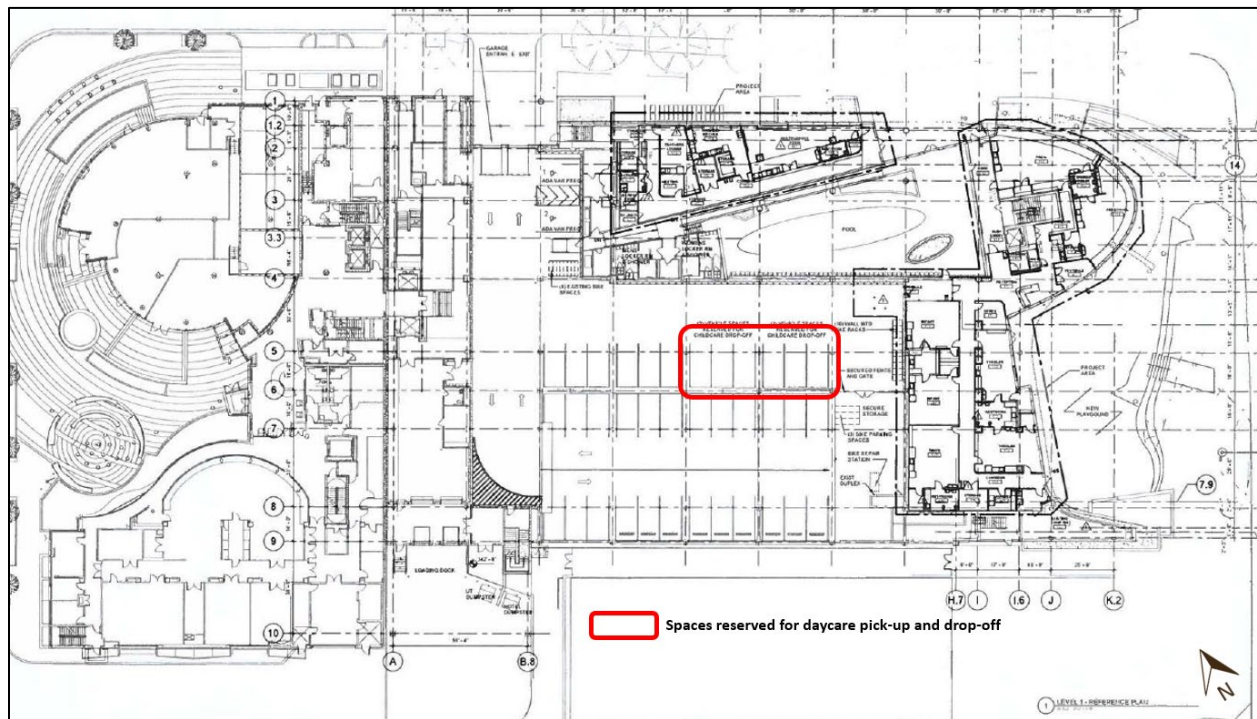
Existing Parking Garage layout showing dedicated parking spaces for daycare
